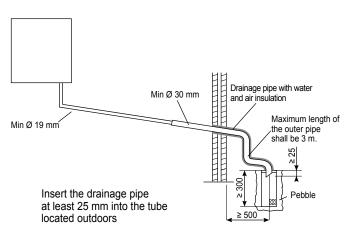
Outside Connection of Condensate Water Drainage Pipe
